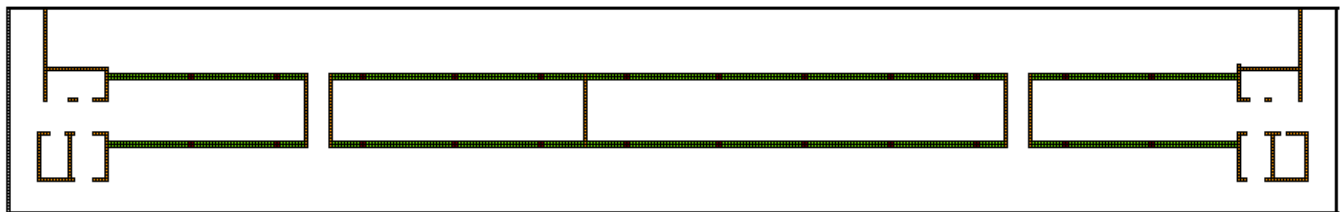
Plane view of the floorplate supports showing the beams and columns layout of the wooden frame.
